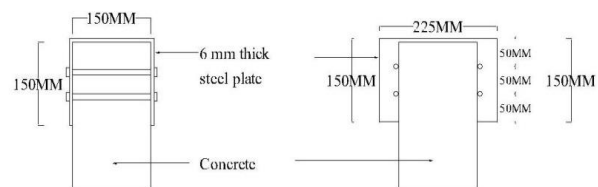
Steel jacket to prevent local buckling of longitudinal reinforcement at column ends
